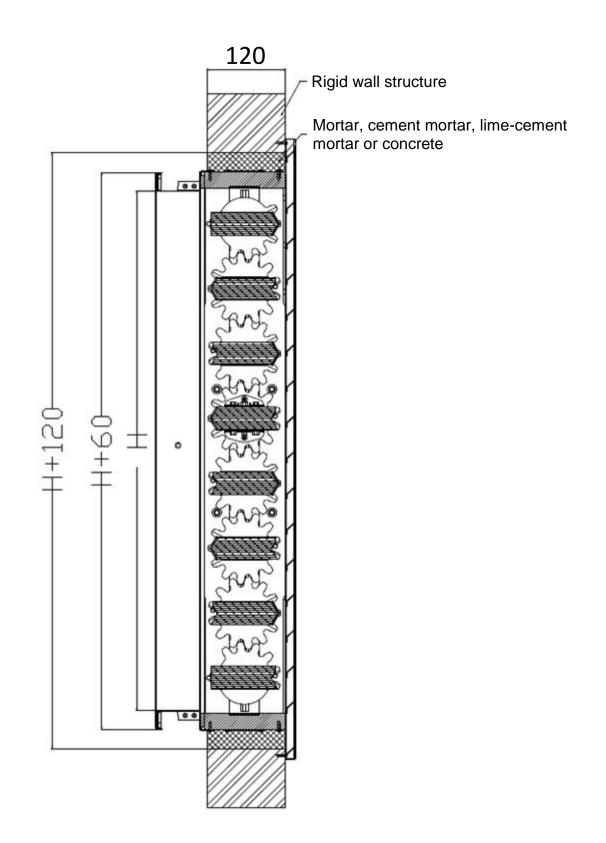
The way of installing WKP fire dampers with KST grilles in rigid wall structures.
